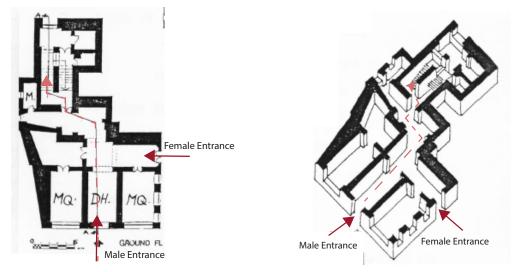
Noor Wali House. The stairs are located at the far-left end of the house for privacy (Khan, 1981, pp. 34–38).
